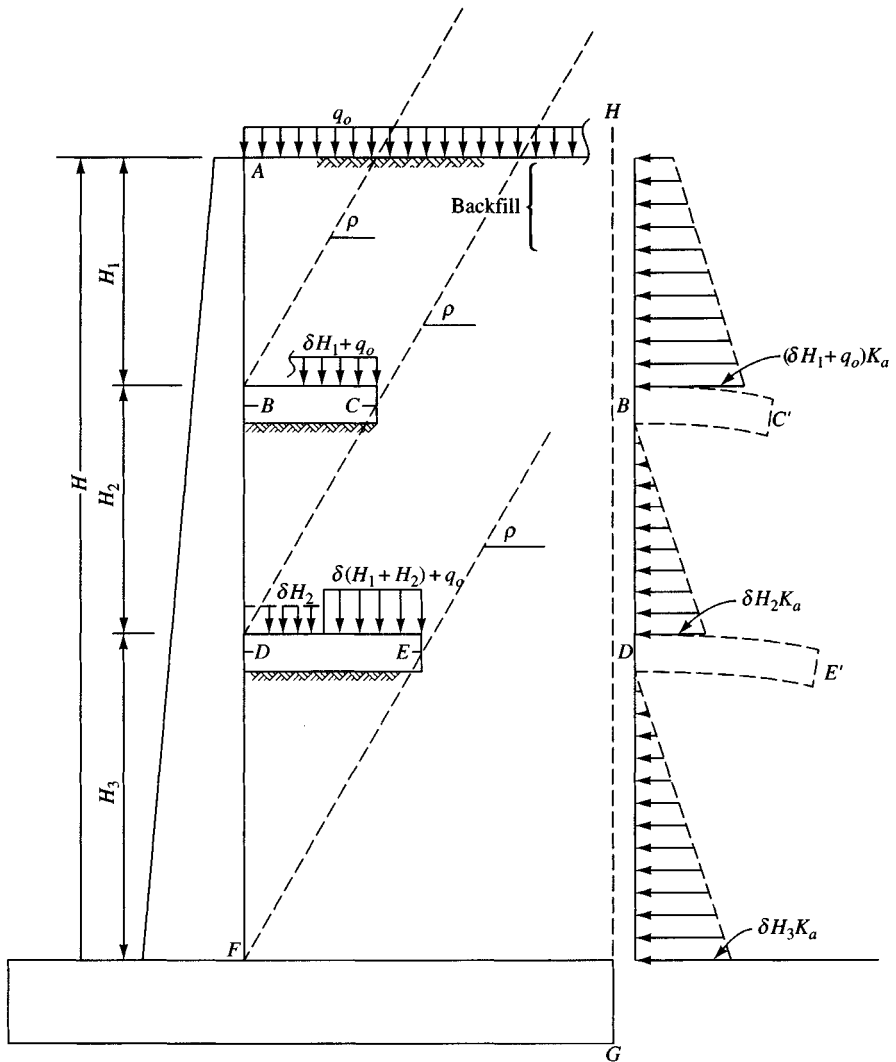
Using "relief shelves" to give an apparent reduction in the lateral wall (stem) pressure.
